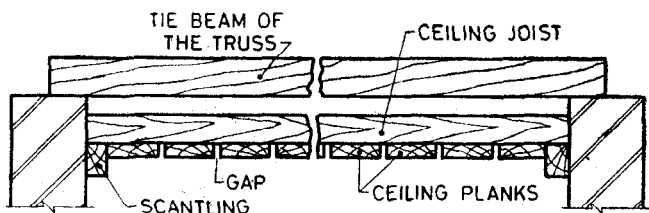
CLOSED CEILING INDEPENDENT BELOW TIE
